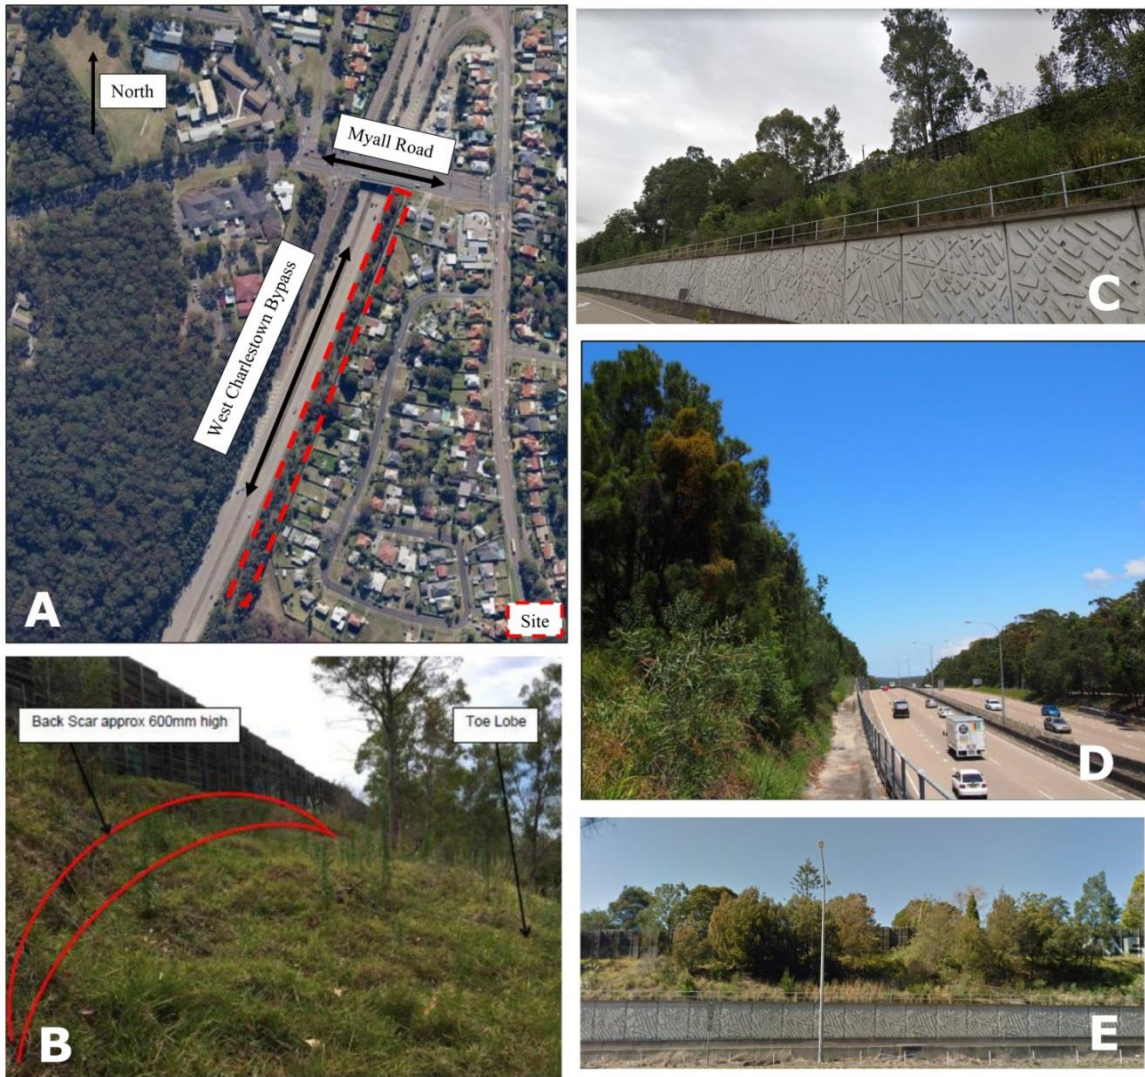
Aerial view of the site (A), the slope and the retaining wall (C,D,E) and cracks due to shallow instability (B).
